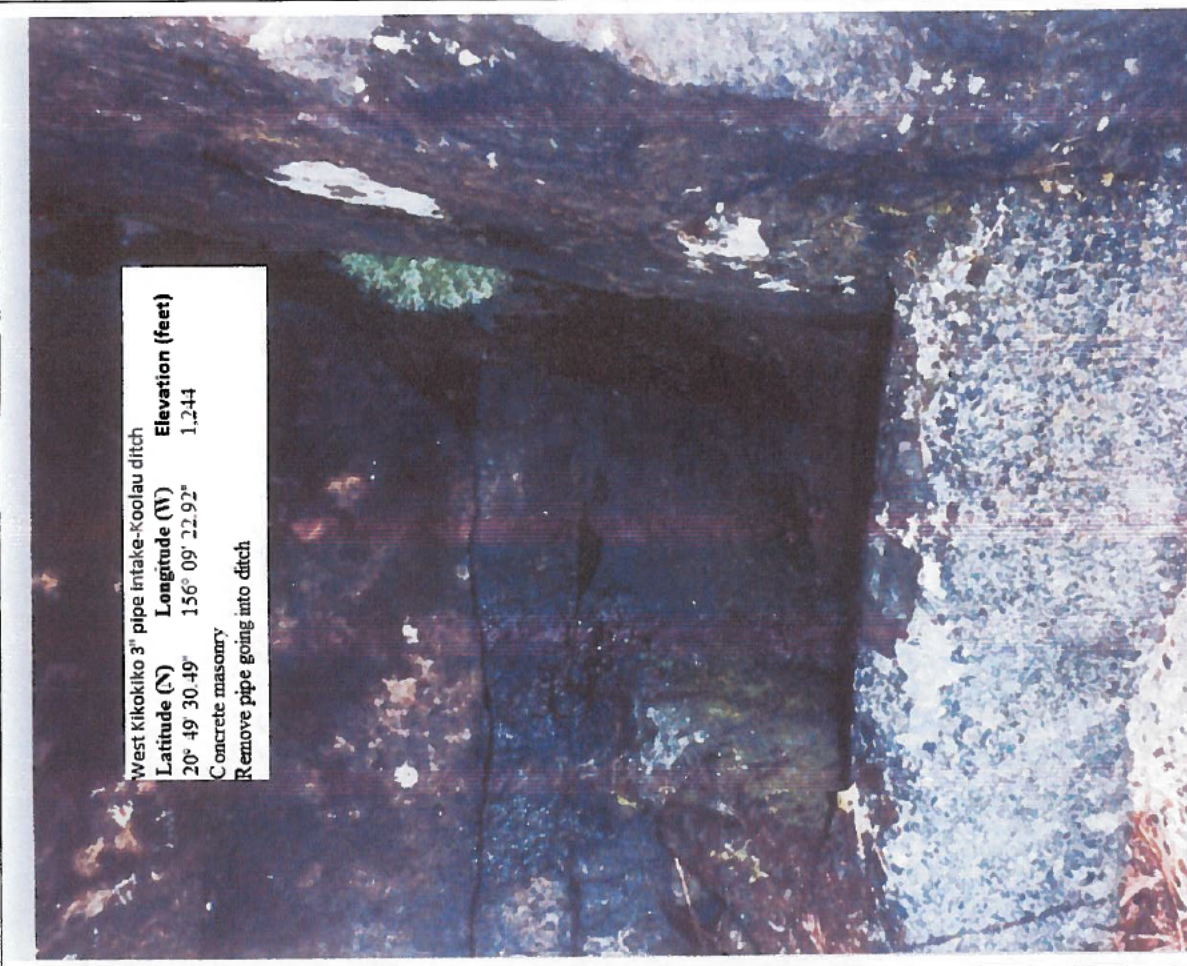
Kikokiko small intake at Koolau Ditch (K-25b) Intake was sealed with concrete in 2007.
